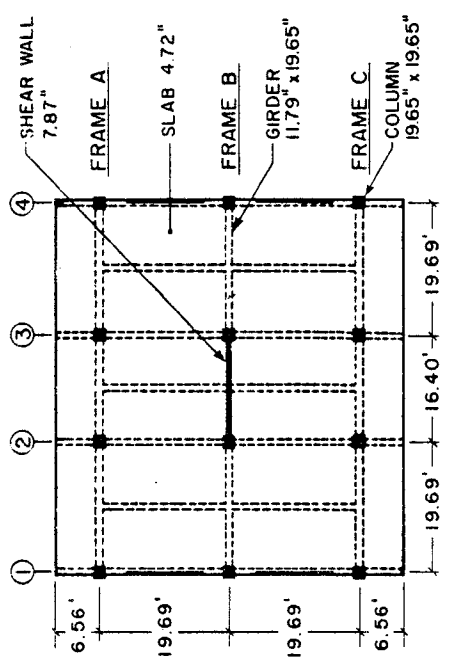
PLAN & FRAME B OF TEST BUILDING
